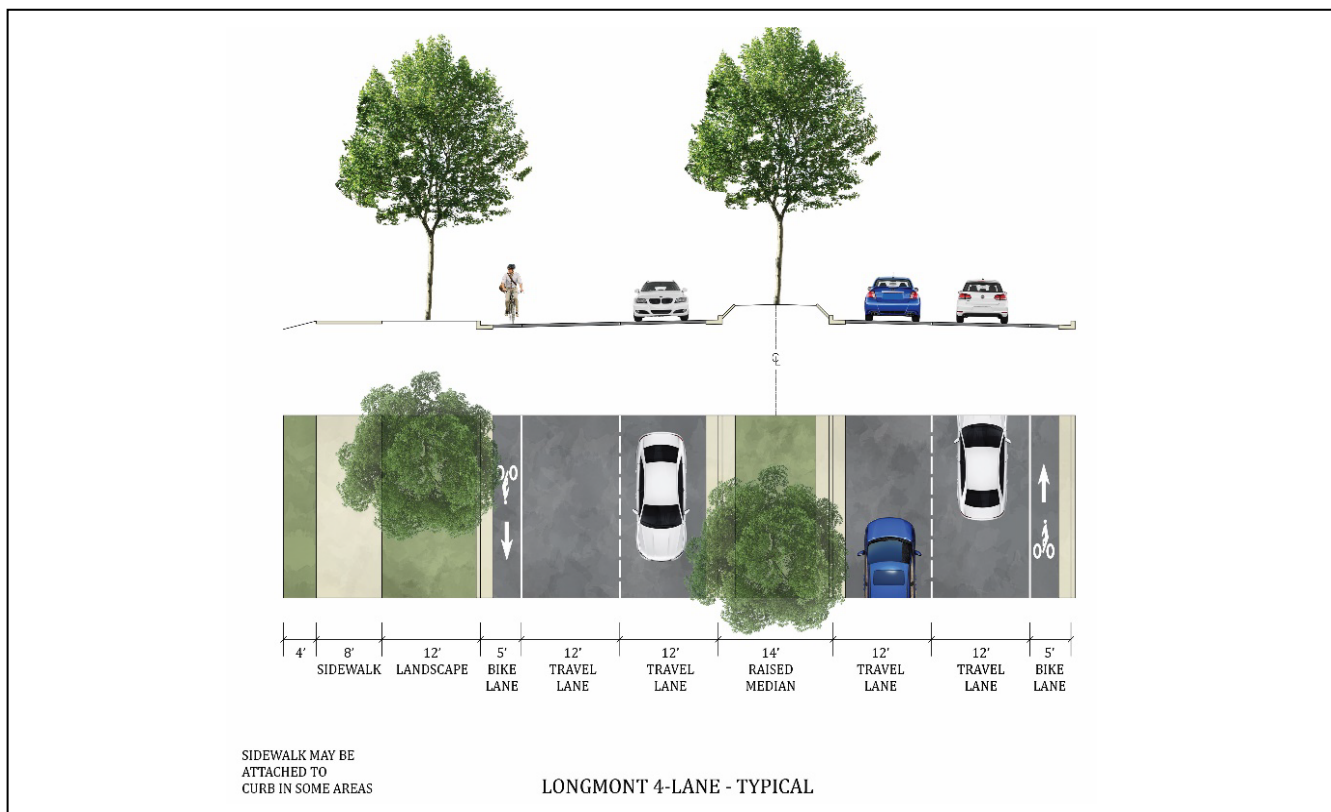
BOULDER COUNTY/WELD COUNTY RECOMMENDED CROSS-SECTIONS
